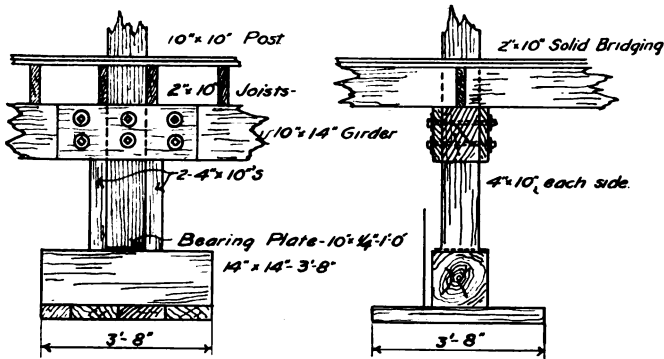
TIMBER FOOTING FOR COLUMN EXTENDING THROUGH FLOOR.
